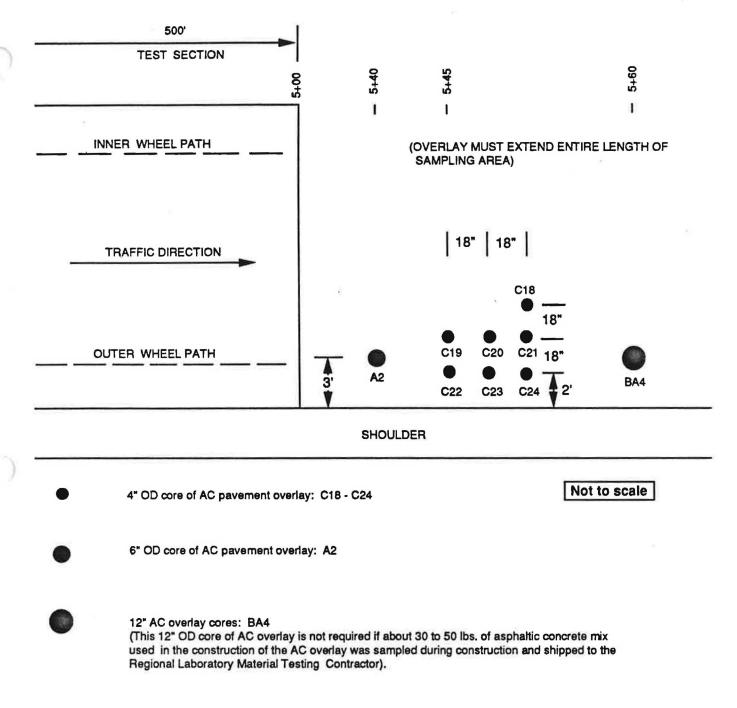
<u>After Overlay</u> Sampling Point Locations After Test Section, GPS-6 Asphalt Concrete Overlay Over Asphalt Concrete (Alternative Sampling Plan) - Case 2
